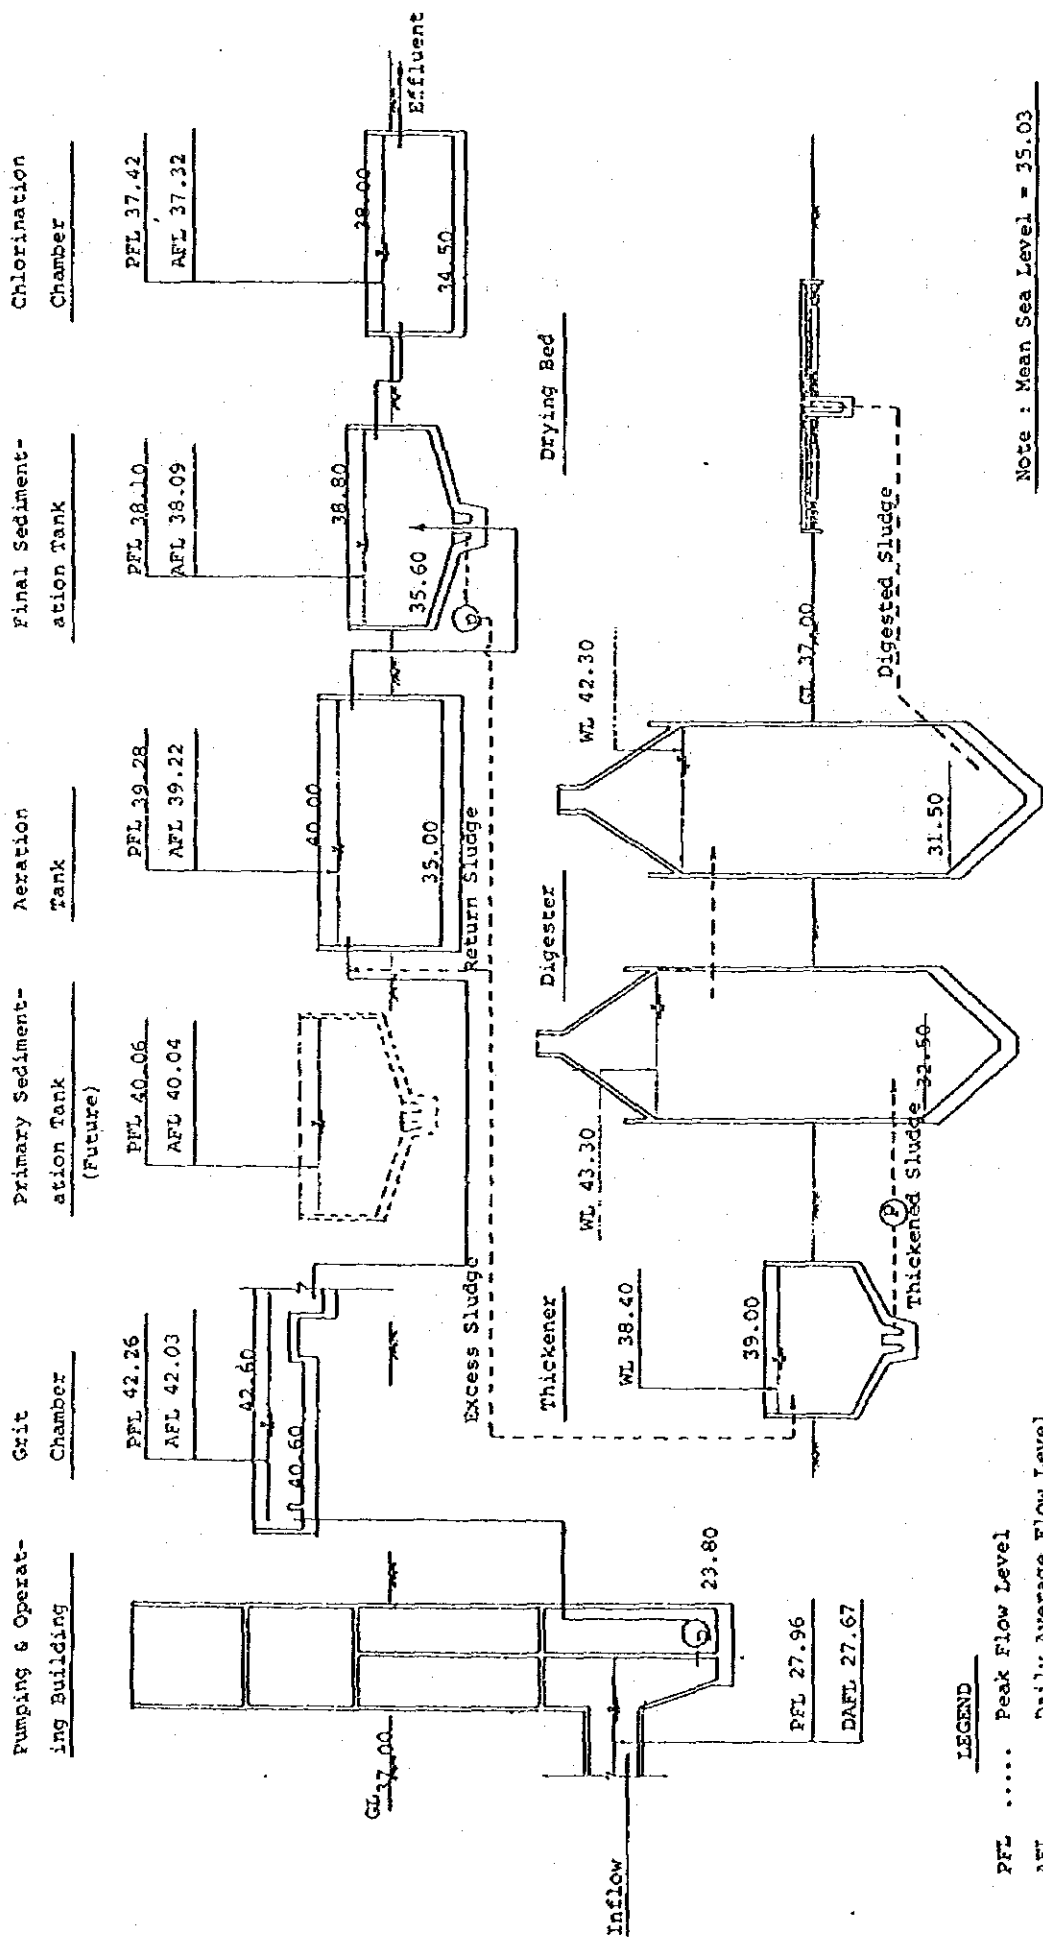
Hydraulic Profile of Proposed Treatment Facilities
